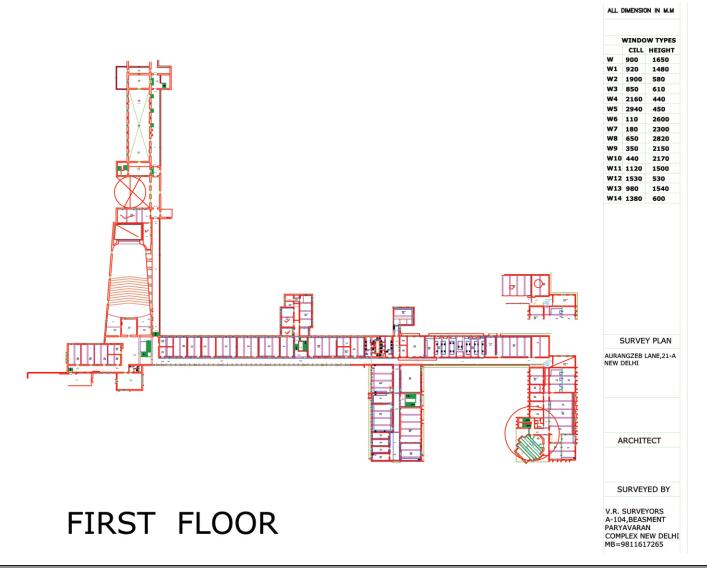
(c): Layout plan of MH Academic Block : First Floor
